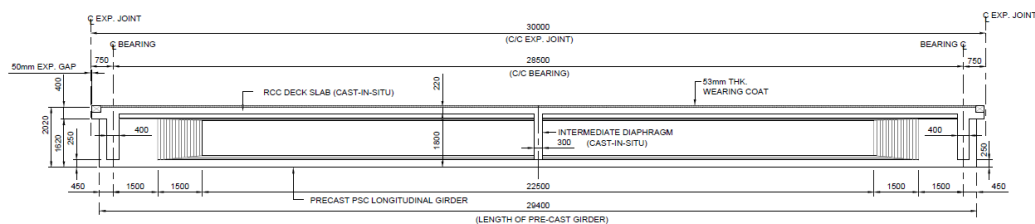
5 Elevation of 30m span OC post tensioned I girder
